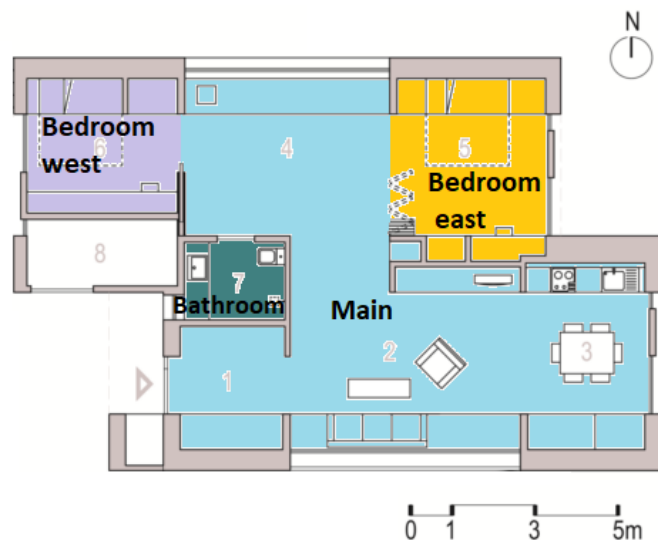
Thermal zones that can be separated using the doors. The small bedroom upstairs (not appearing on this drawing) is part of the 'Main' zone. (Picture from [1], adapted and reused with permission)
